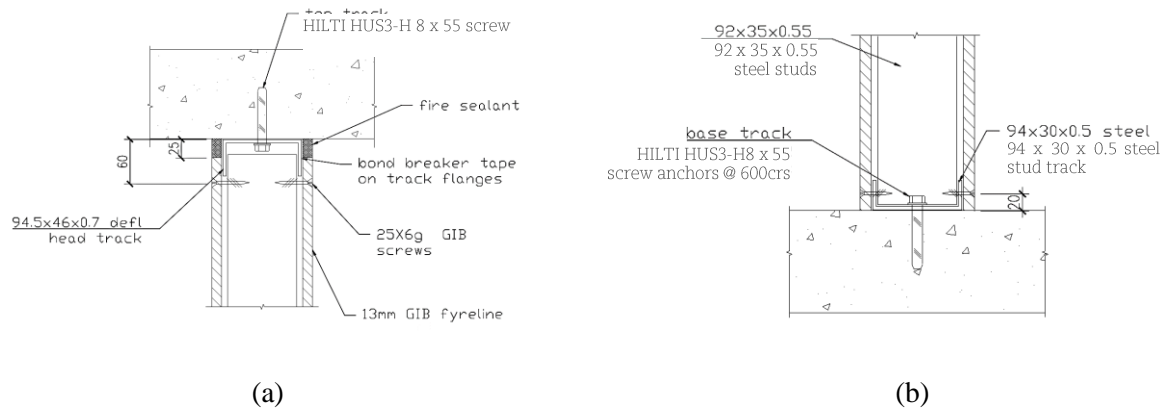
(a) Top slab connection, (b) base slab connection.
